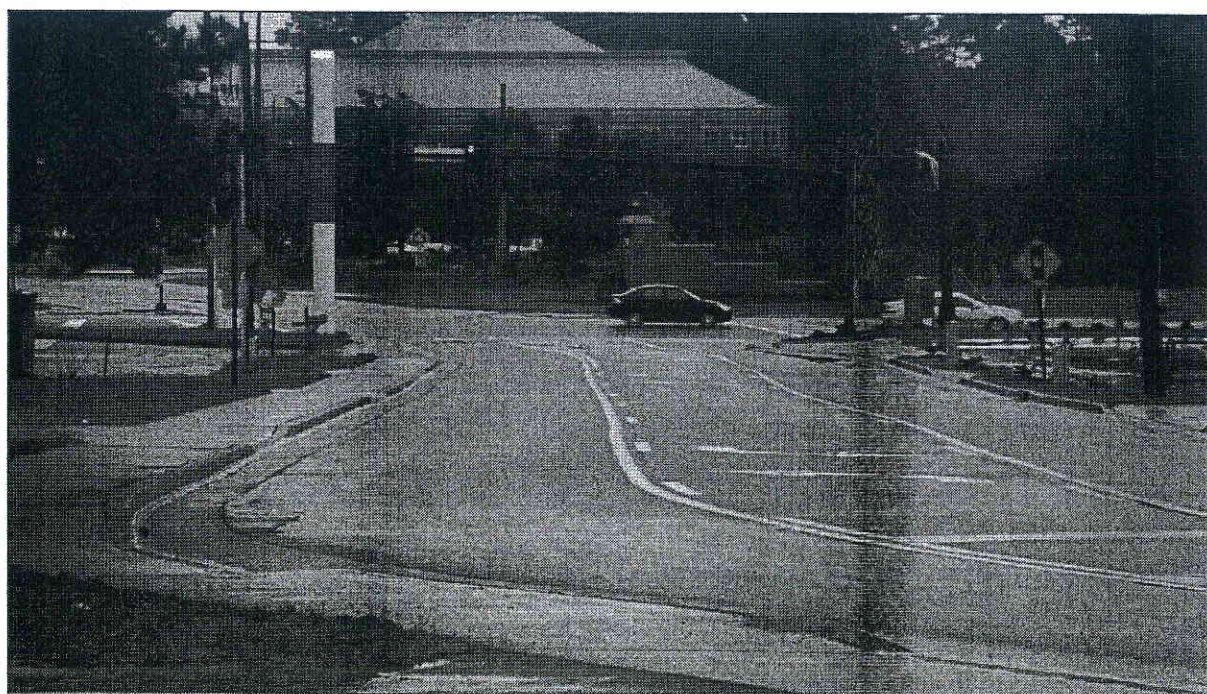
Intersection of Rucker Lane and Highway 310 South – viewed from Rucker Lane.
